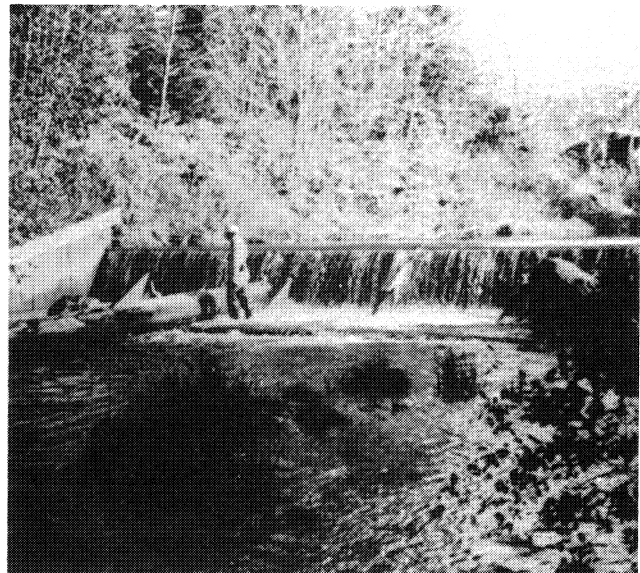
Dam at outlet of Cavanaugh Lake on Lake Creek.
